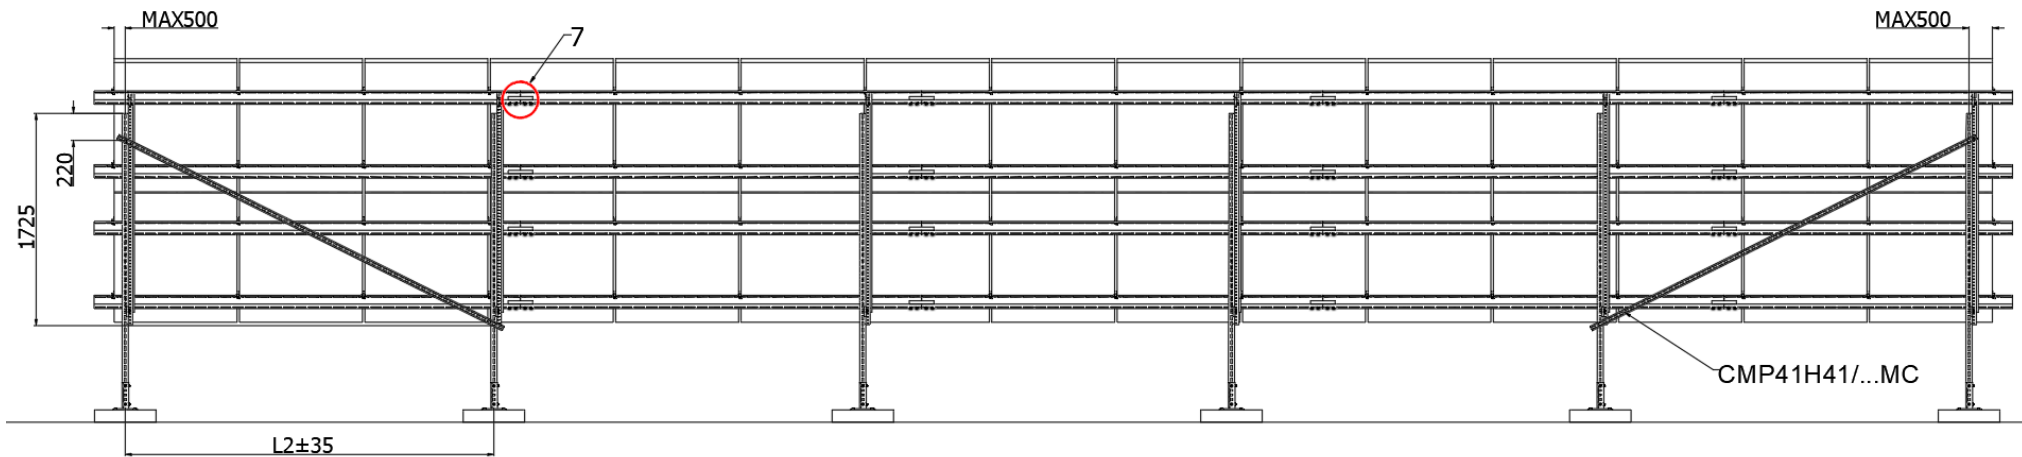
View of the structure from the north side with bracing spacing No. 2
